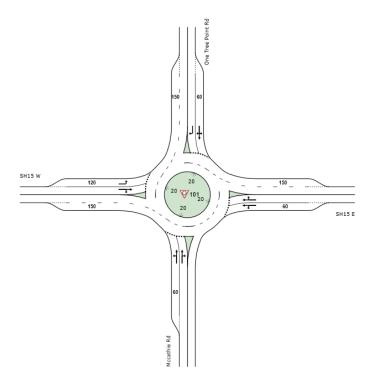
Proposed roundabout at SH15/One Tree Point Road/McCathie Road intersection
